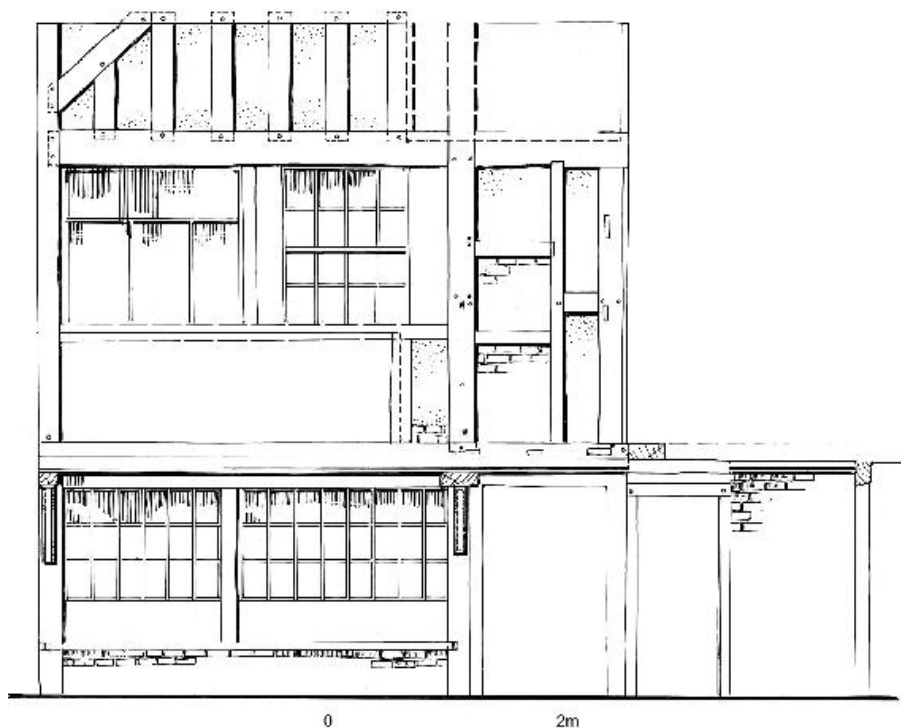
Elevation of the much-altered northern jettied side frame of the central block of 14 Church Street prior to renovation
